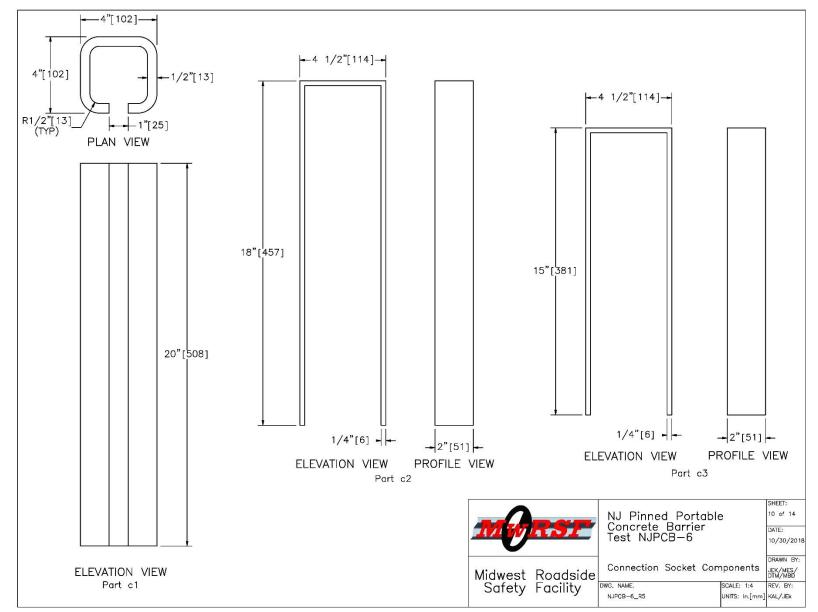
PCB Connection Socket Component Details, Test No. NJPCB-6
